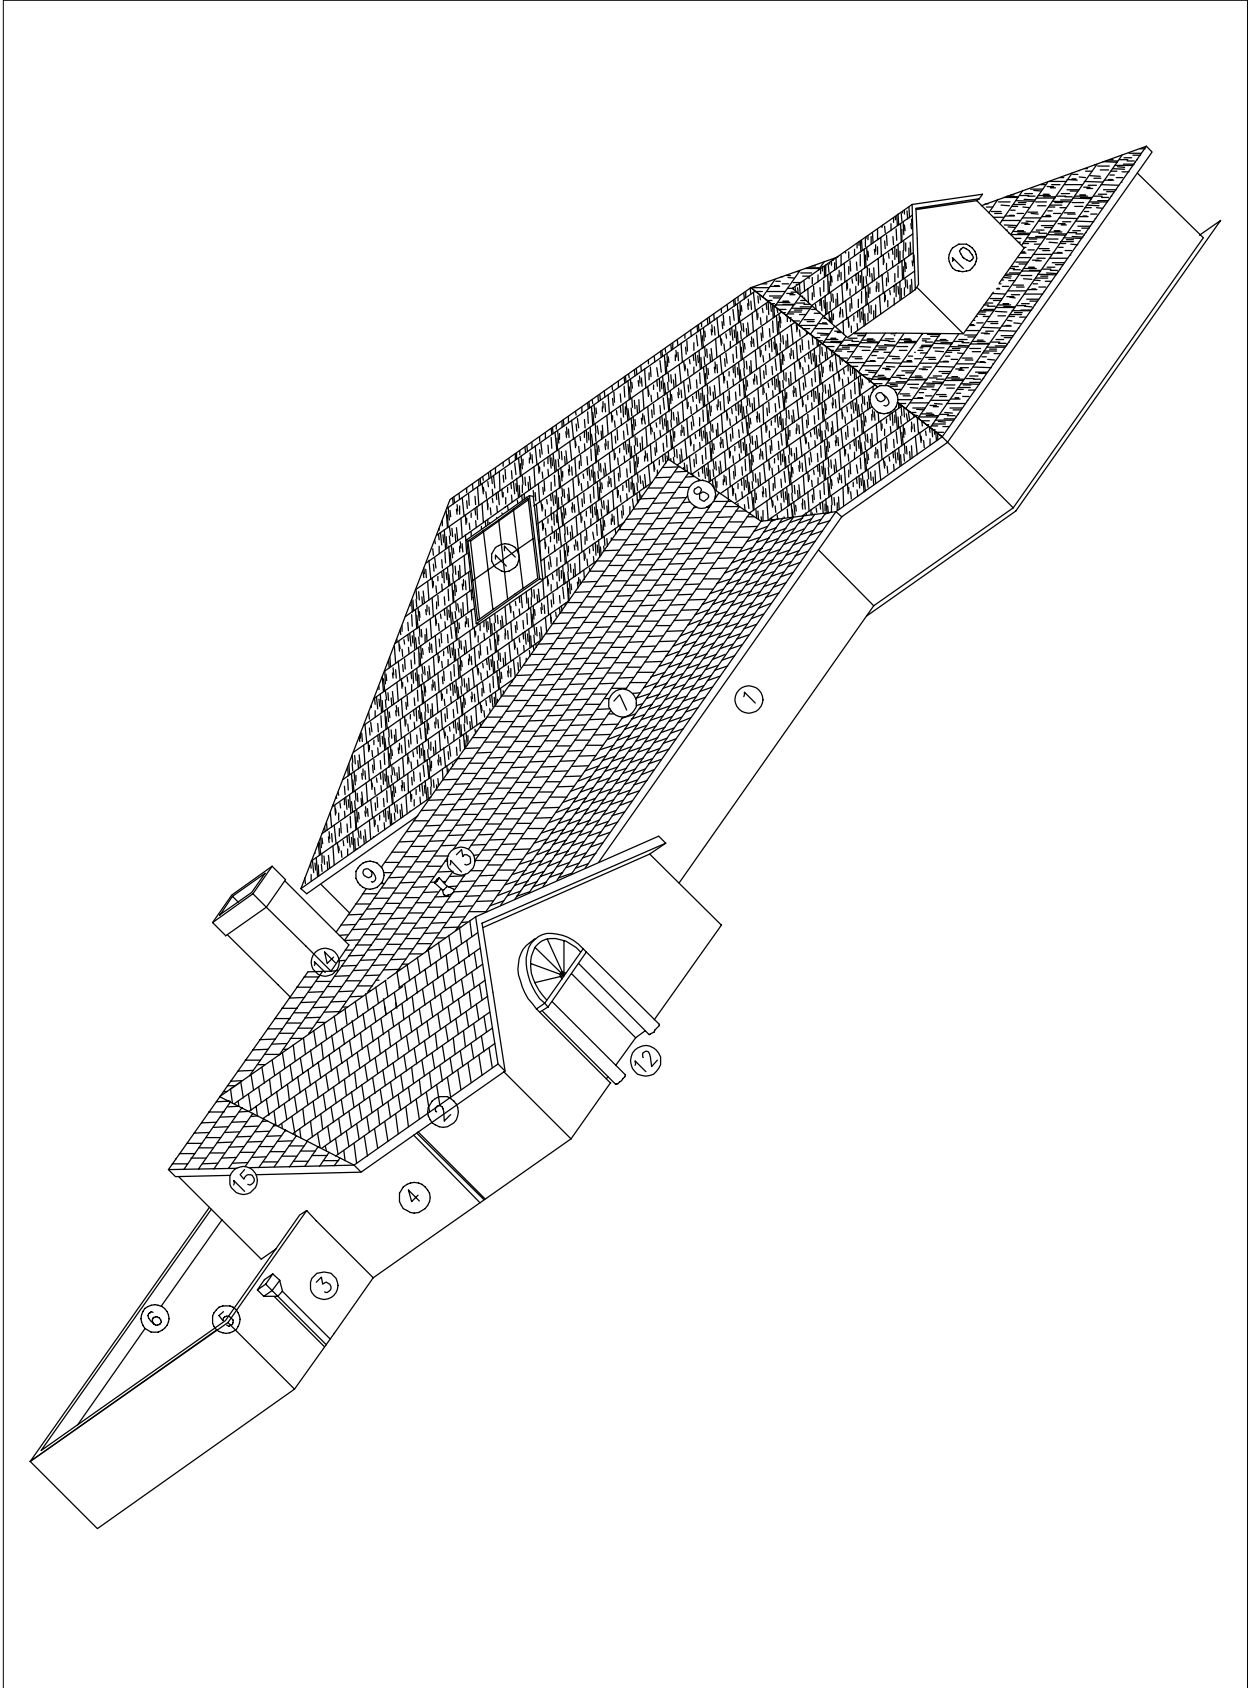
TYPICAL SHINGLE/TILE/SLATE-ROOF PLAN
